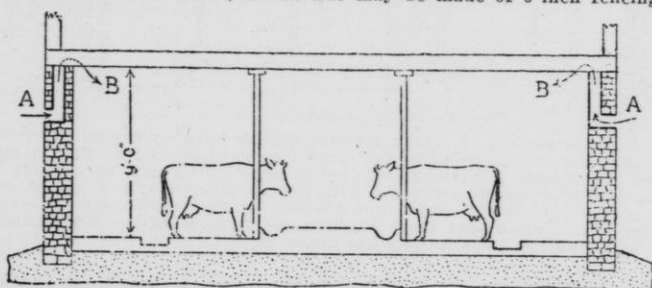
Shows a modification of Fig. 1 where on the right a notch is left in the wall when building, so that the flue rises flush with the inside of the wall. While on the left side the flue is shown built in the wall. This may be done by building around 5 inch drain tile or around a box made of fencing.
